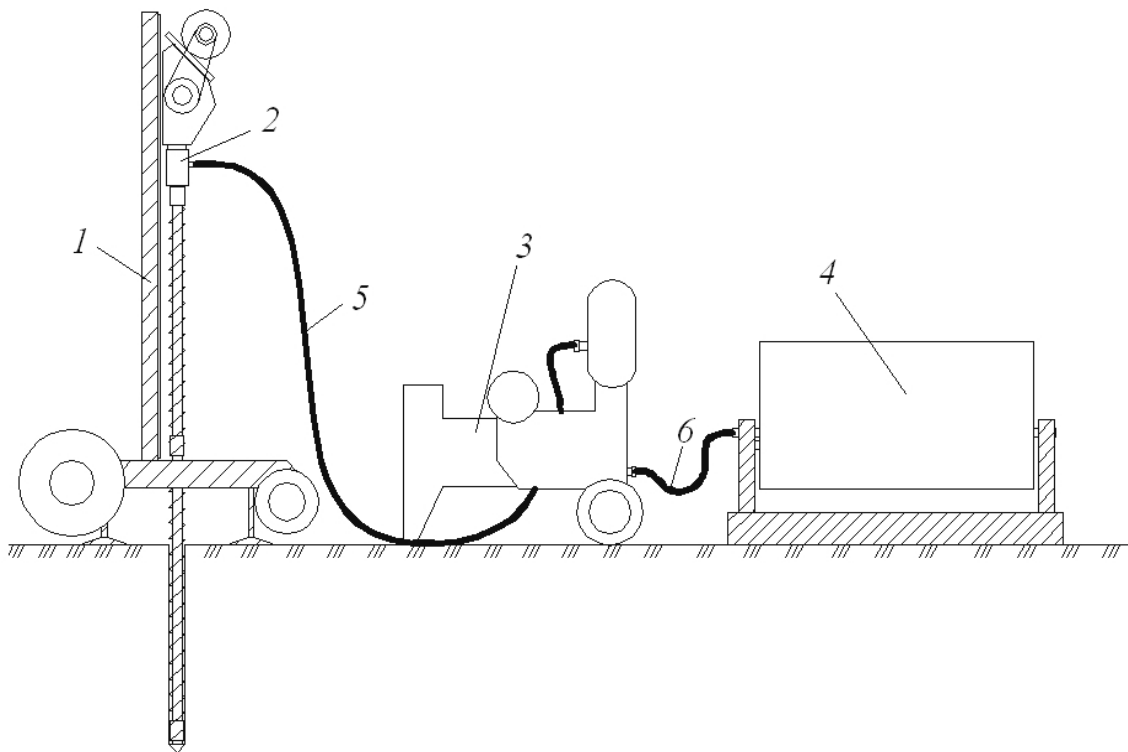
Set of equipment for the installation of soil-cement elements:
